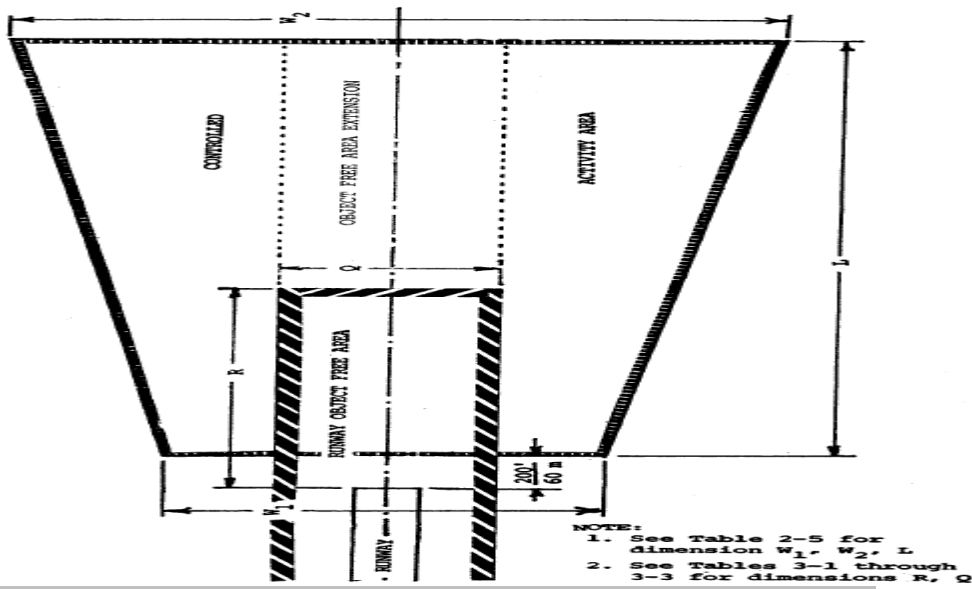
Figure E. Runway Protection Zone and Extended OFA - Refer to AC 150/5300-13
